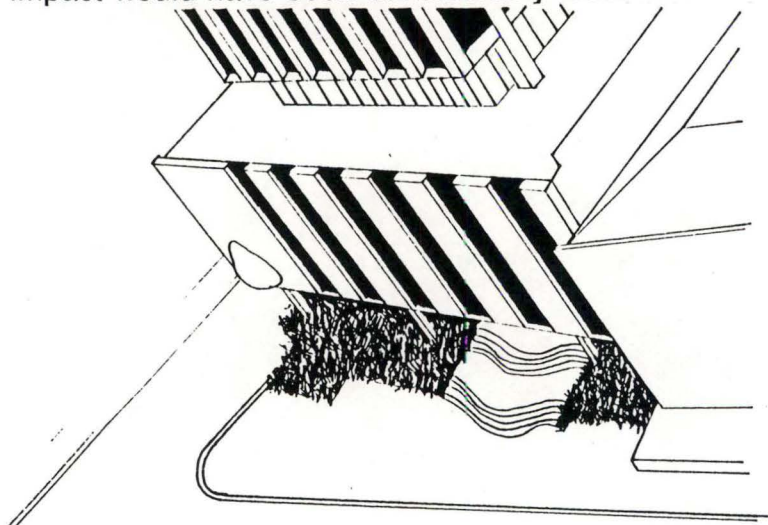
The A.M.P. Building podium; the building's walls are at right angles, the street intersection is not.
